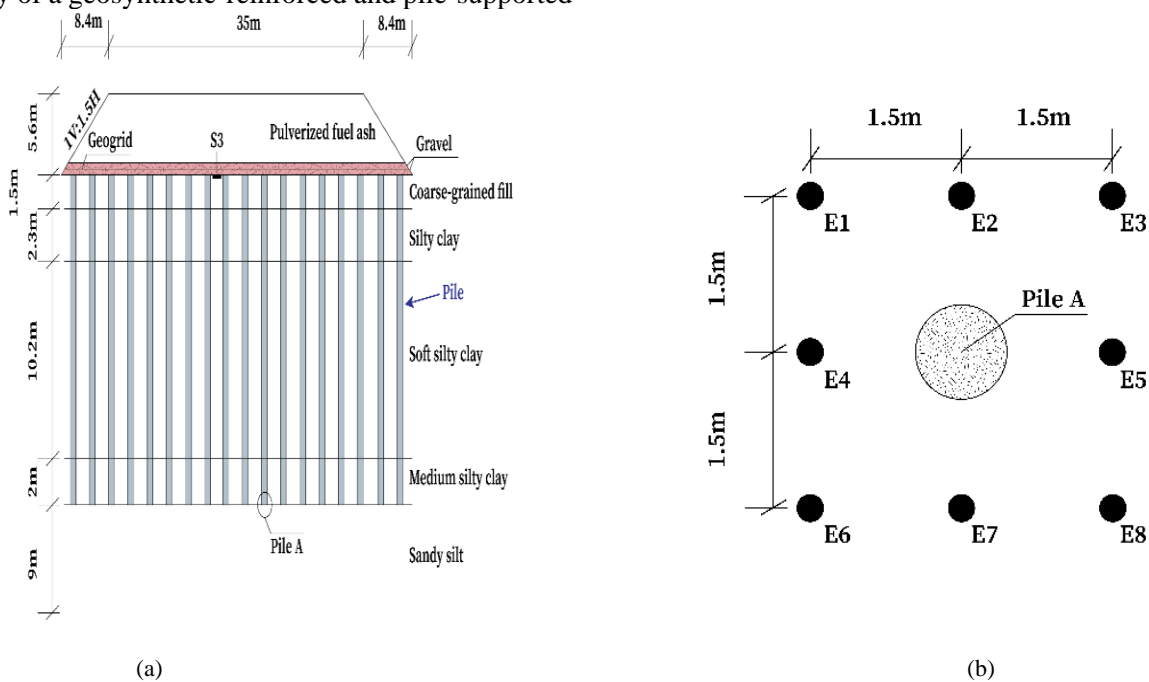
Cross-section (a) and plan view of pile A (b) of the embankment [16]
